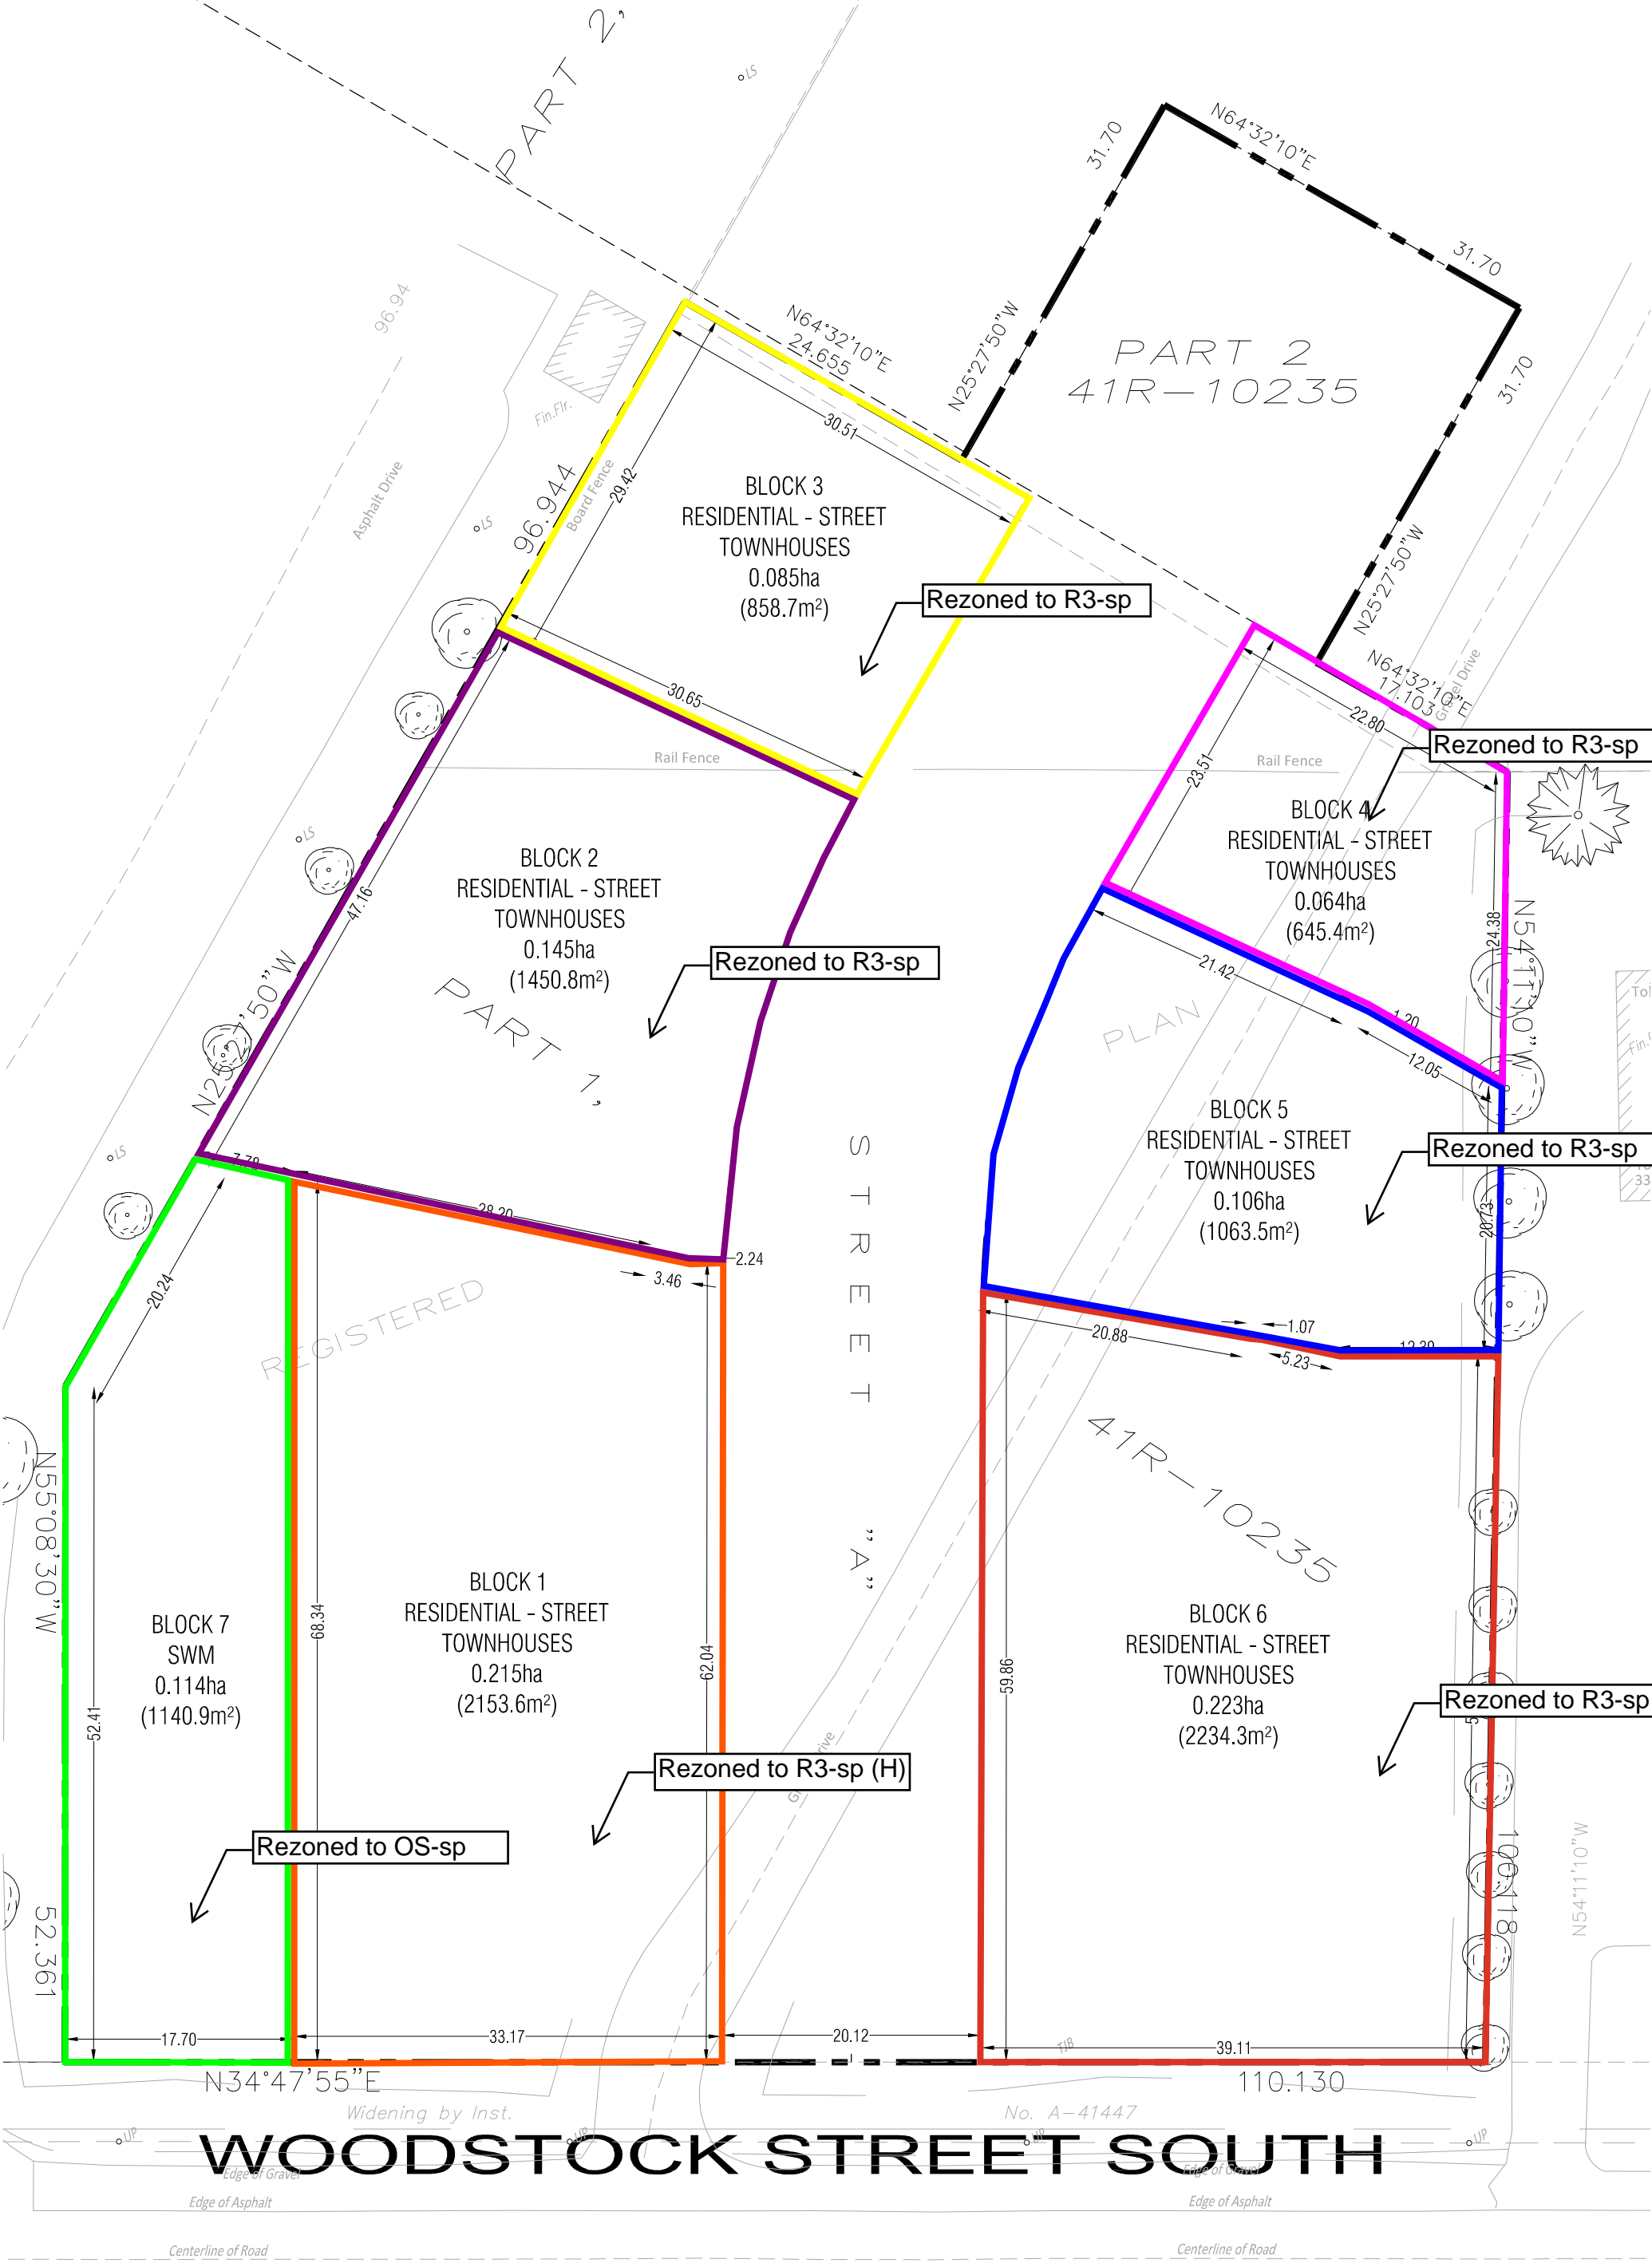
Proposed Draft Plan of Subdivision (Proposed Zoning)
